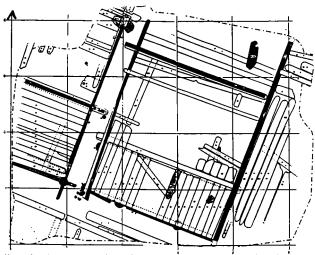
Plan of one of the timber-framed buildings excavated in the centre of the town.
